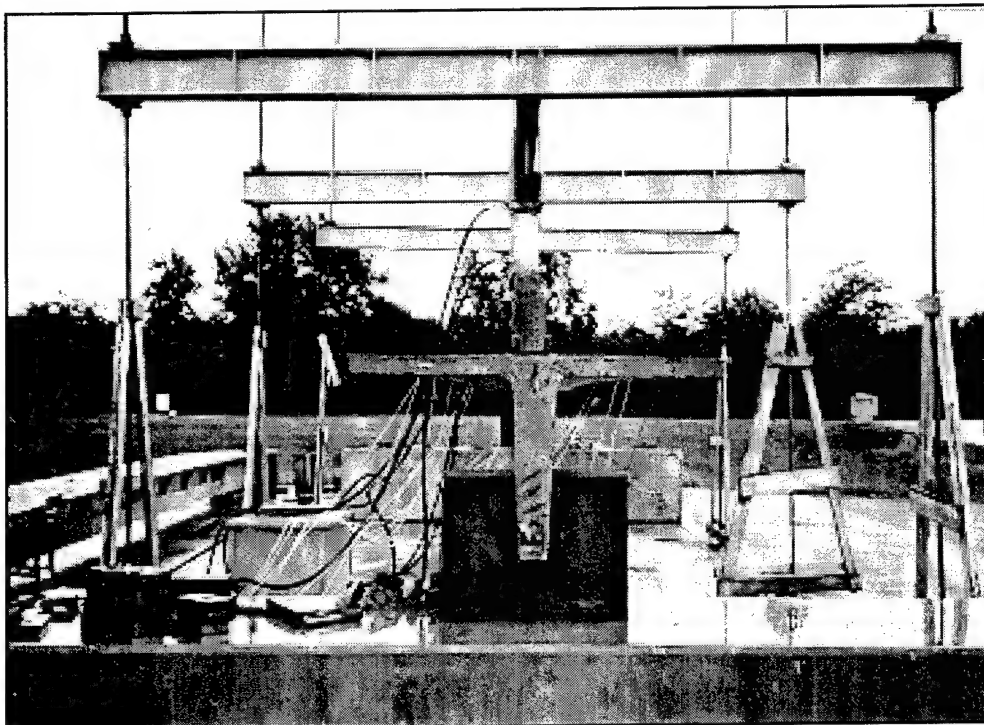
Test set-up of Series 2 single-tee beams with web openings.
